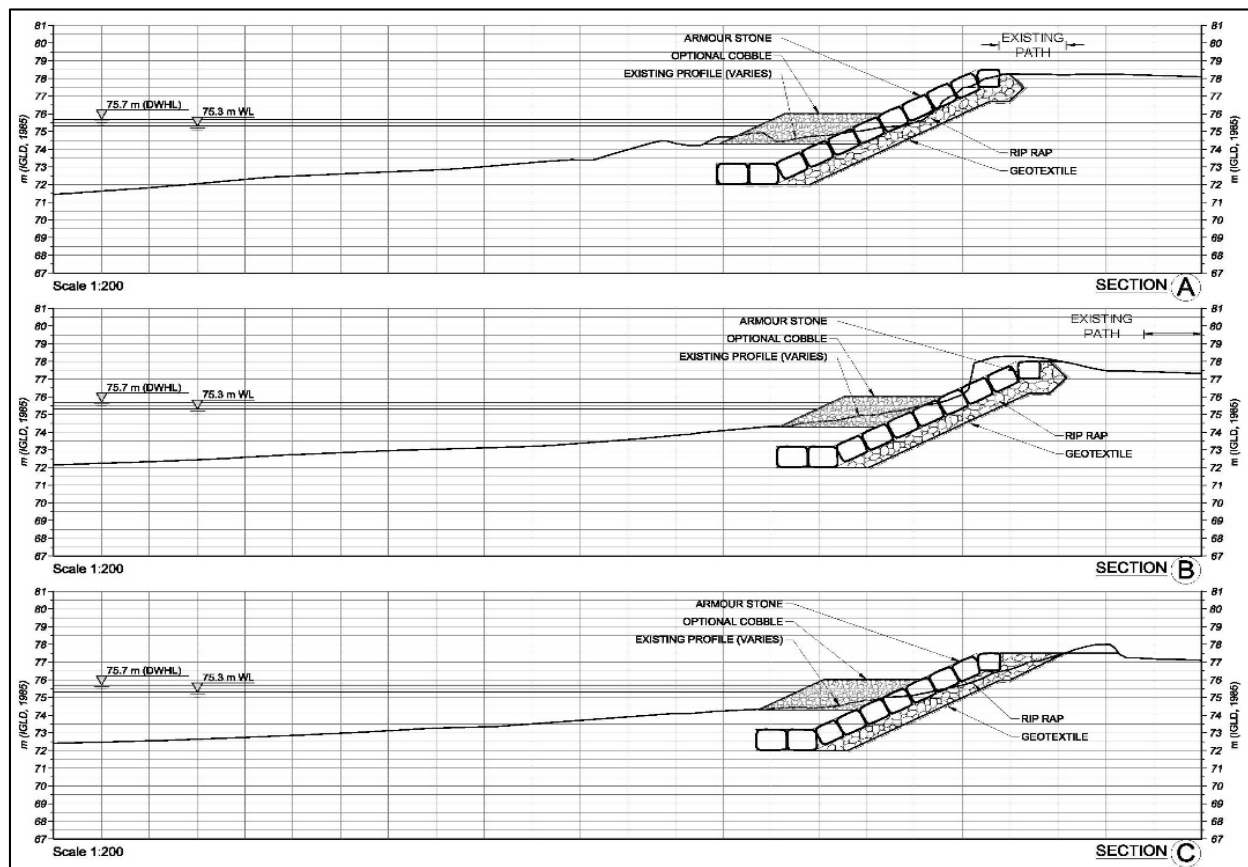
Concept design cross-sections for Option 2B - Armourstone Revetment. *Source: Shoreplan Engineering, 2017.
